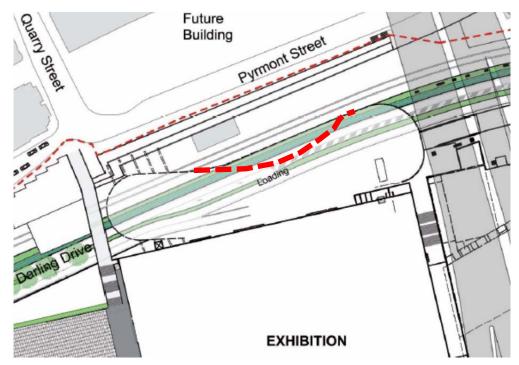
Recommended scaling back of Exhibition Centre loading dock Source: Proponent SSD Application
